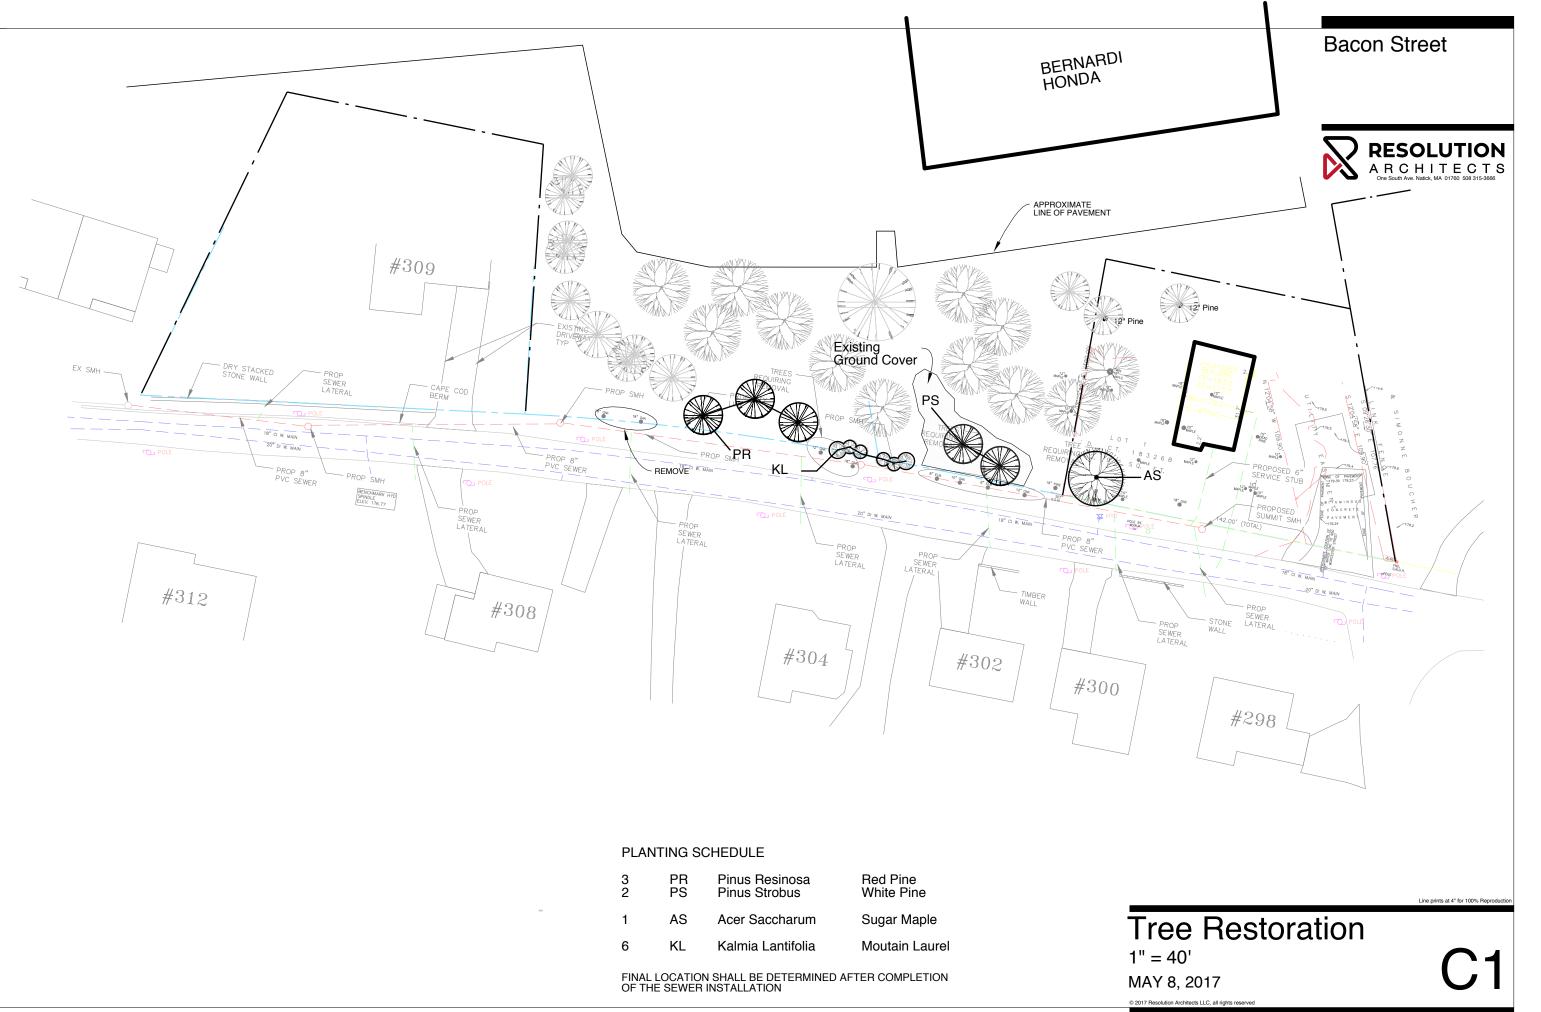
Bacon Street gravity sewer connection project - proposed tree removal plan
